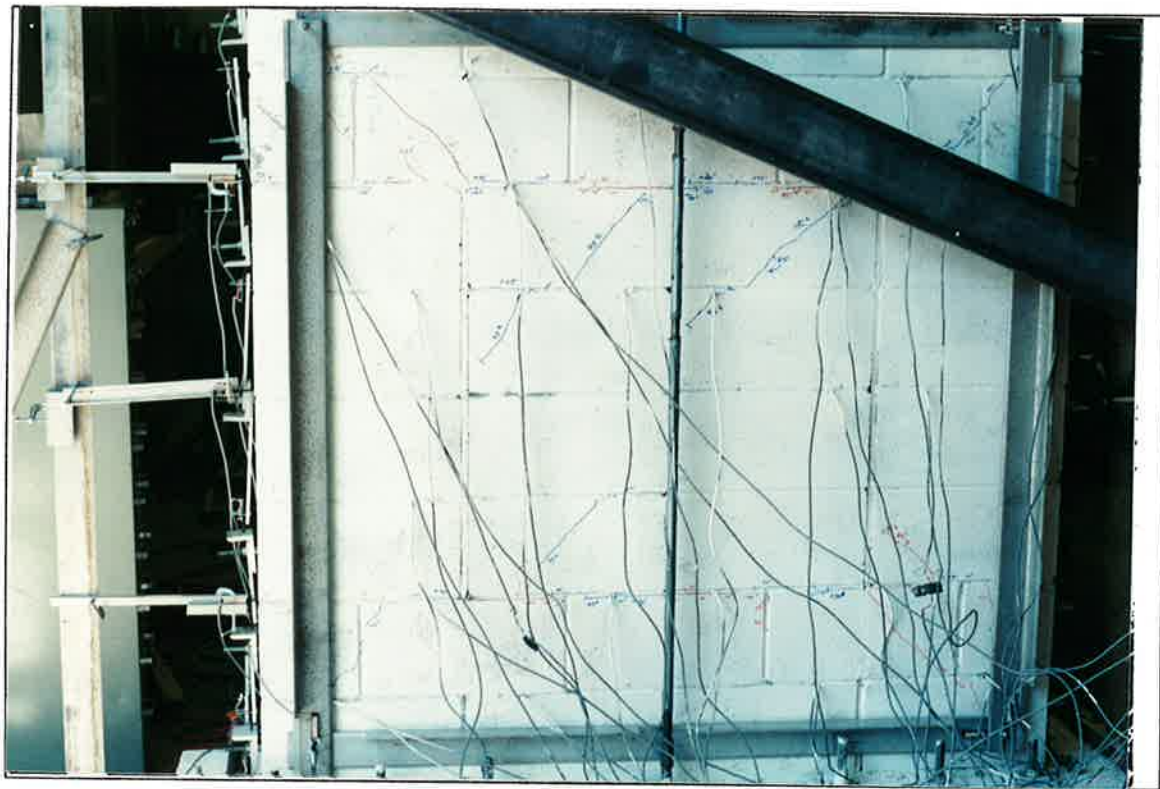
Slitted Wall South Face At 200 kN (45 Kips) Lateral Load
